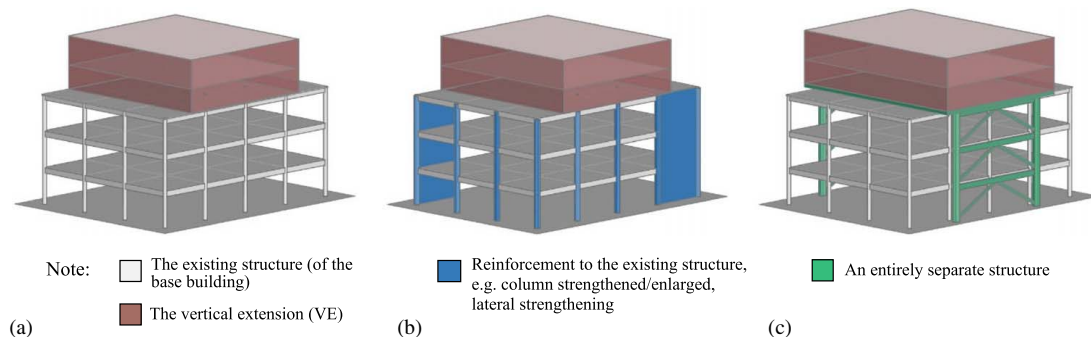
Three identified structural support strategies for VEs: (a) fully supported by existing structure; (b) supported by existing structure with additional reinforcement; and (c) supported by an entirely separate structure.
